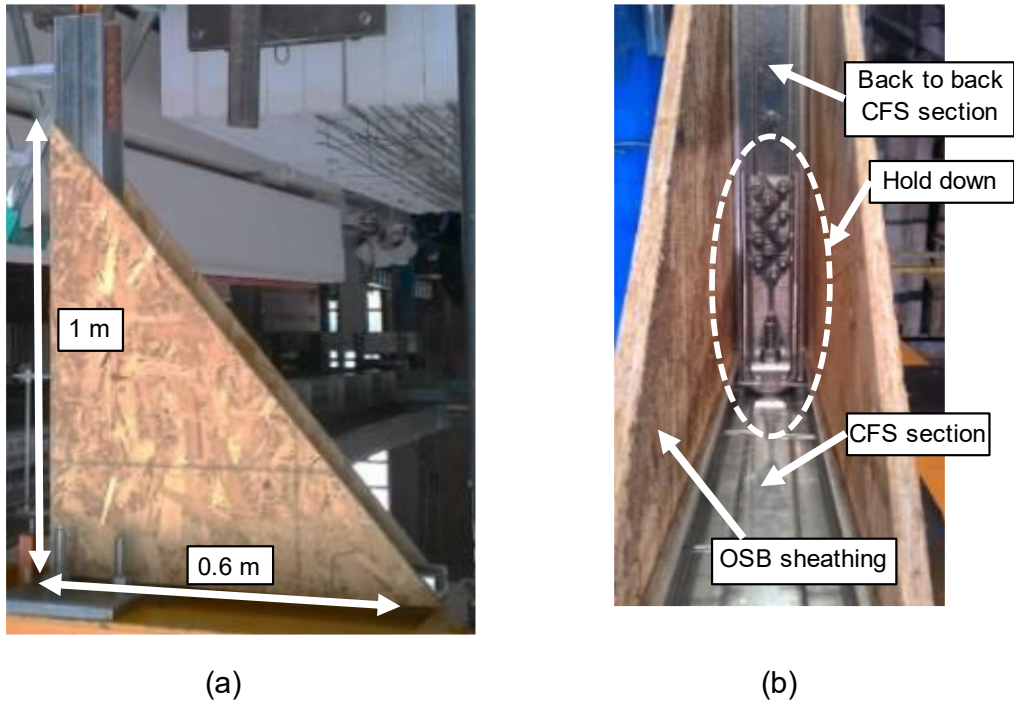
Details of hold down test specimens: (a) dimensions; (b) details
